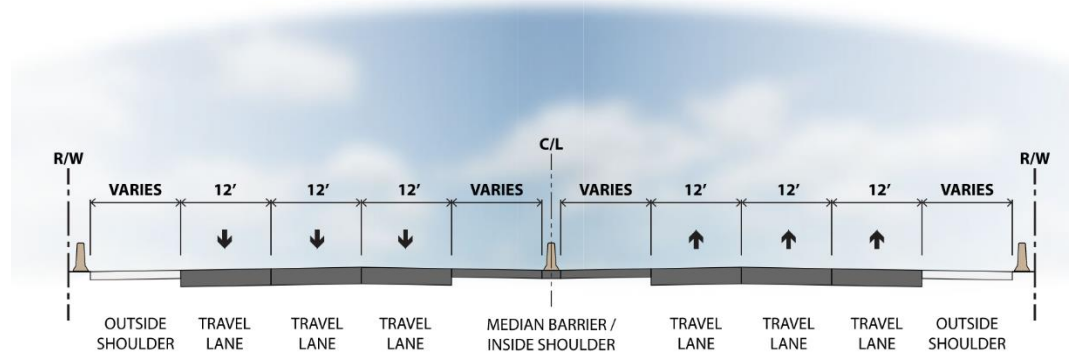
Typical Section of I-65 from West St to Fall Creek in 65/70 Downtown Spoke
